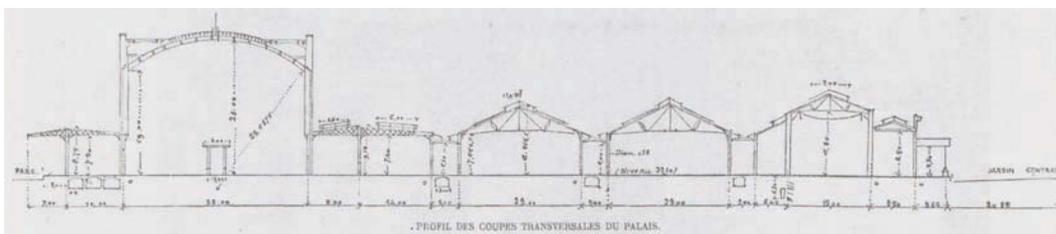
SECTION THROUGH EXHIBITION BUILDING 1867
